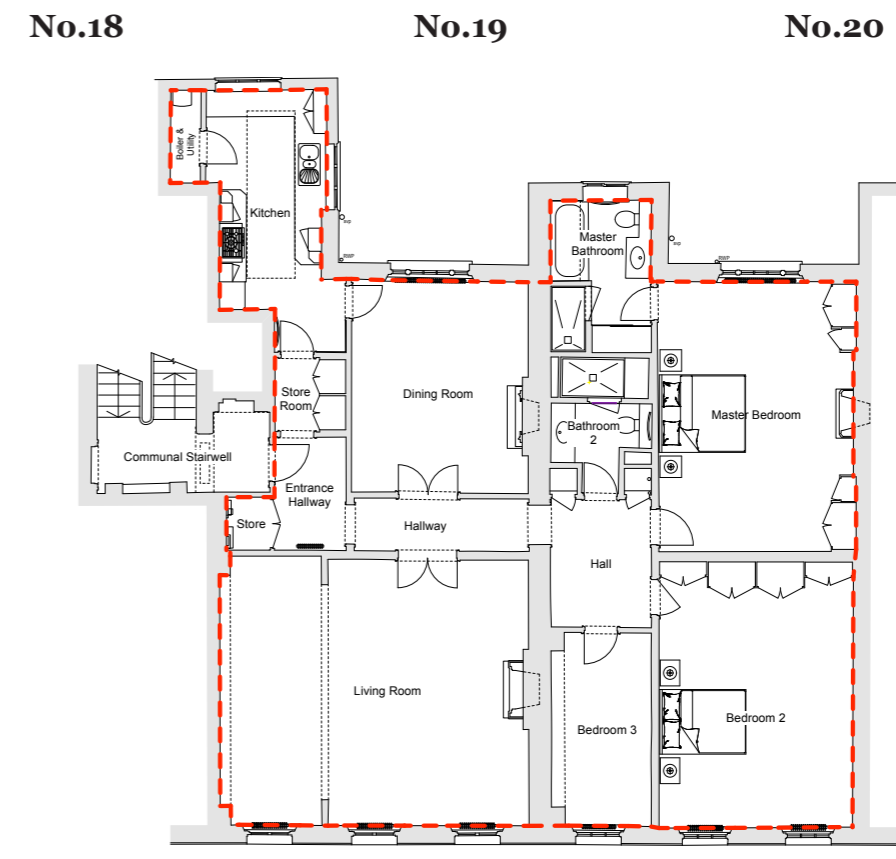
Existing Floor Plan of third floor Flat H 18-20 Eaton Square. Flat H shown in dashed red outline.
